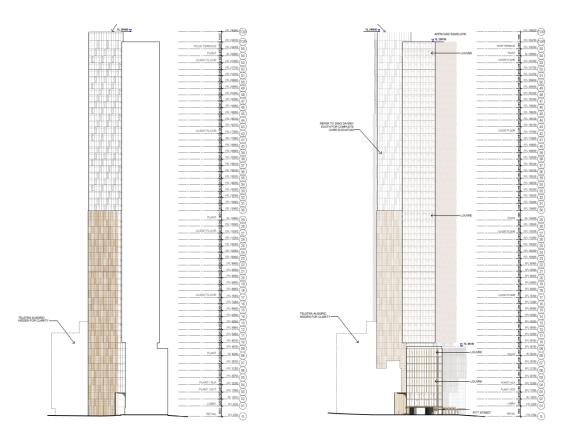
Proposed south elevations - hard/softcore (left) and Dalley Street (right)
